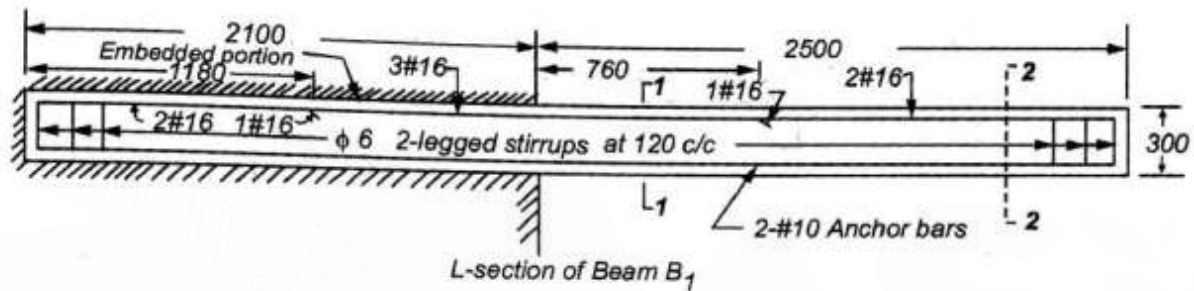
Reinforcement Details of Overhanging Porch
